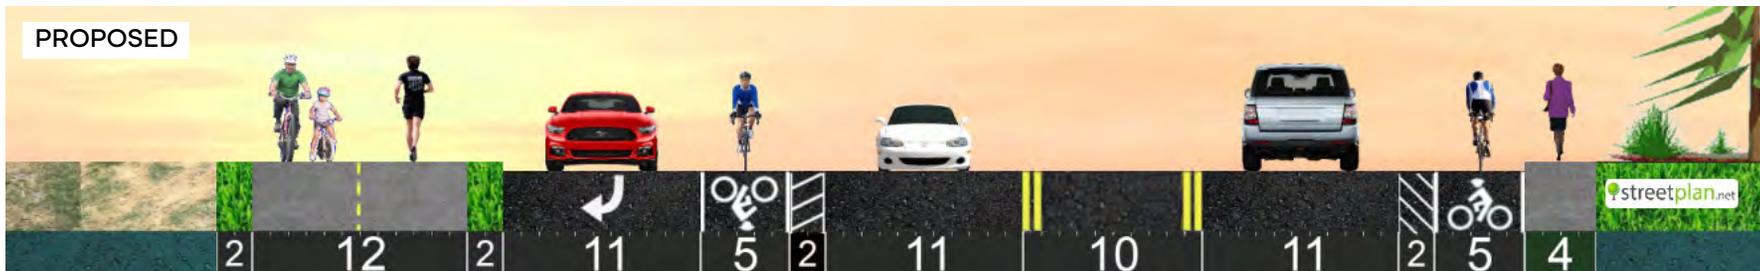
Concept: PVR at Monarch Lane/Pecho Road Mid-Block, looking east
